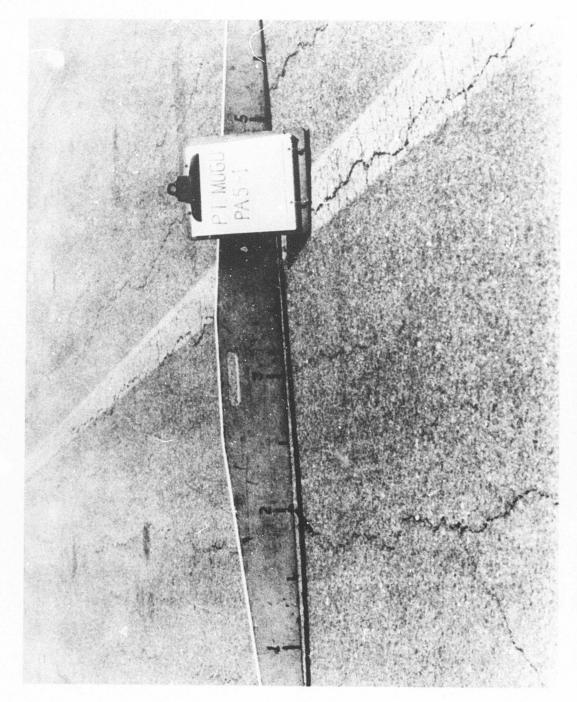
Rutting and pattern cracking, discrete area PA5-1.
